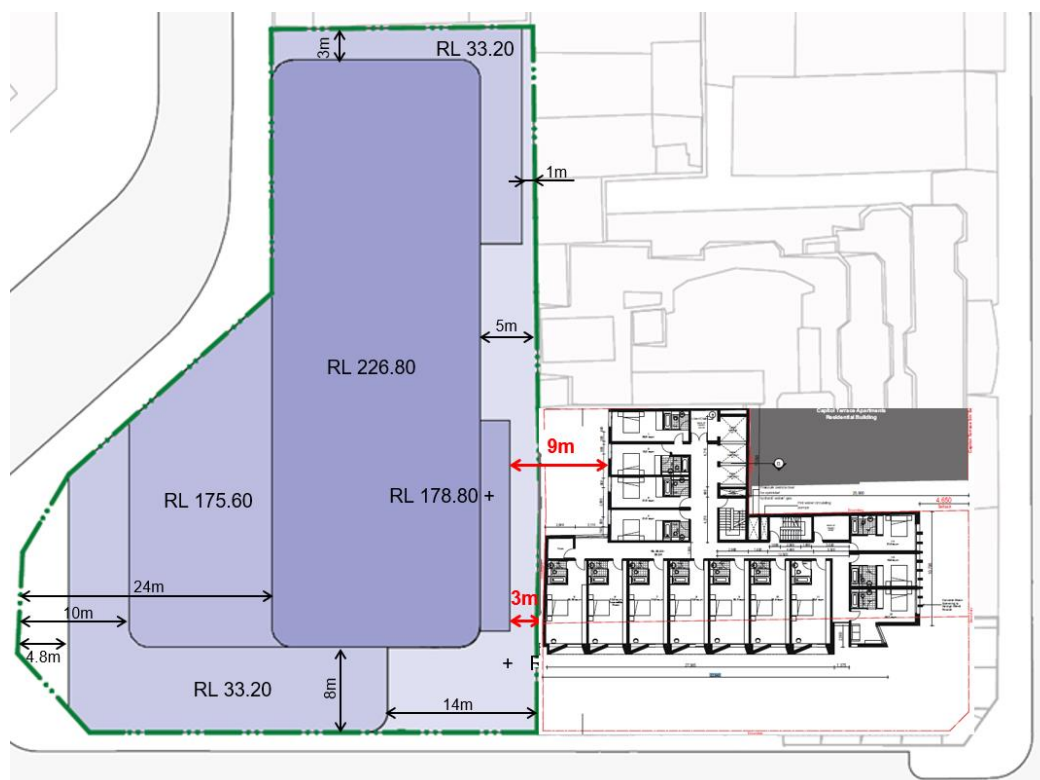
Indicative plans detailing the revised eastern setback of the planning envelope and separation to the west facing hotel rooms approved for the 757-763 George Street site.
